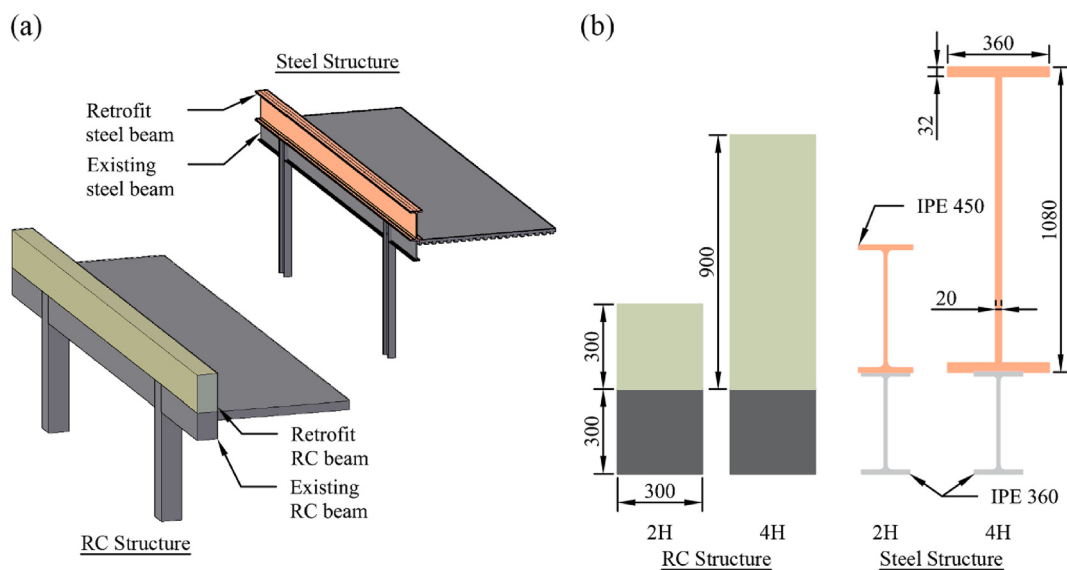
(a) Representation of the proposed retrofitting system in an RC building and a steel building; (b) $2H$ and $4H$ retrofits in RC and steel buildings.
